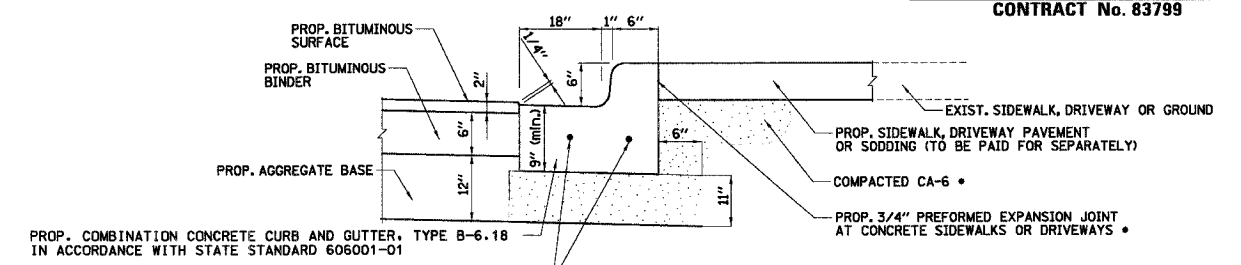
DETAIL OF CURB AND GUTTER AT STRUCTURE WITH TYPE 23 FRAME AND GRATE
